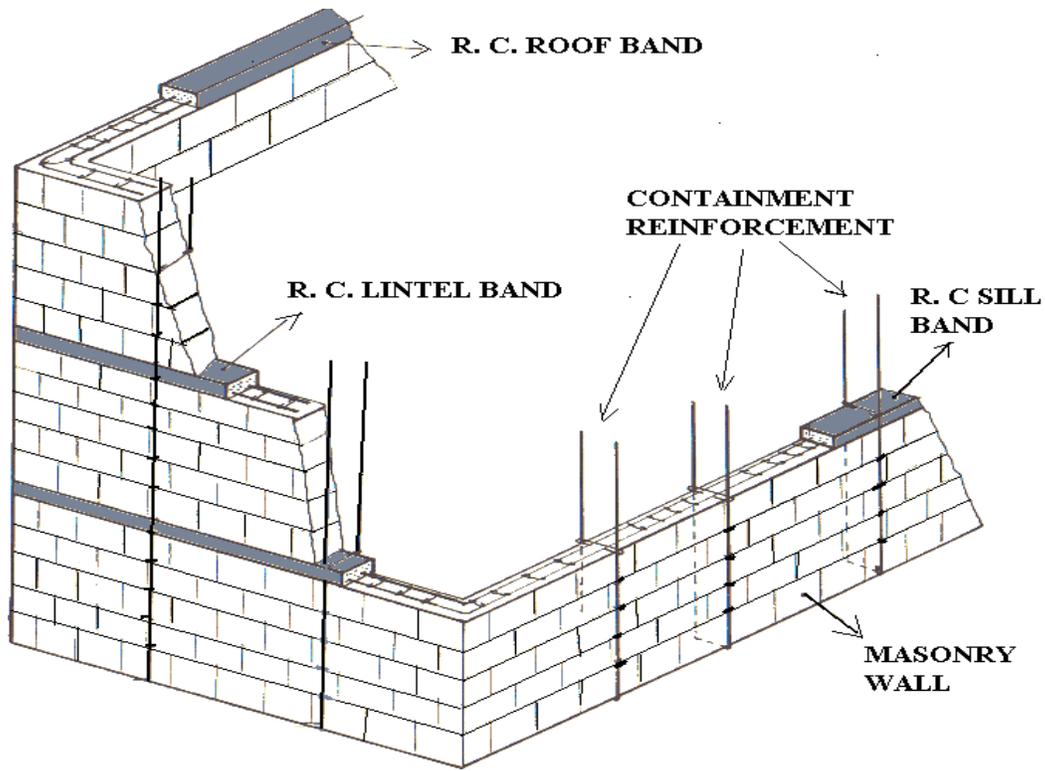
Masonry building with horizontal R.C. bands and containment reinforcement
